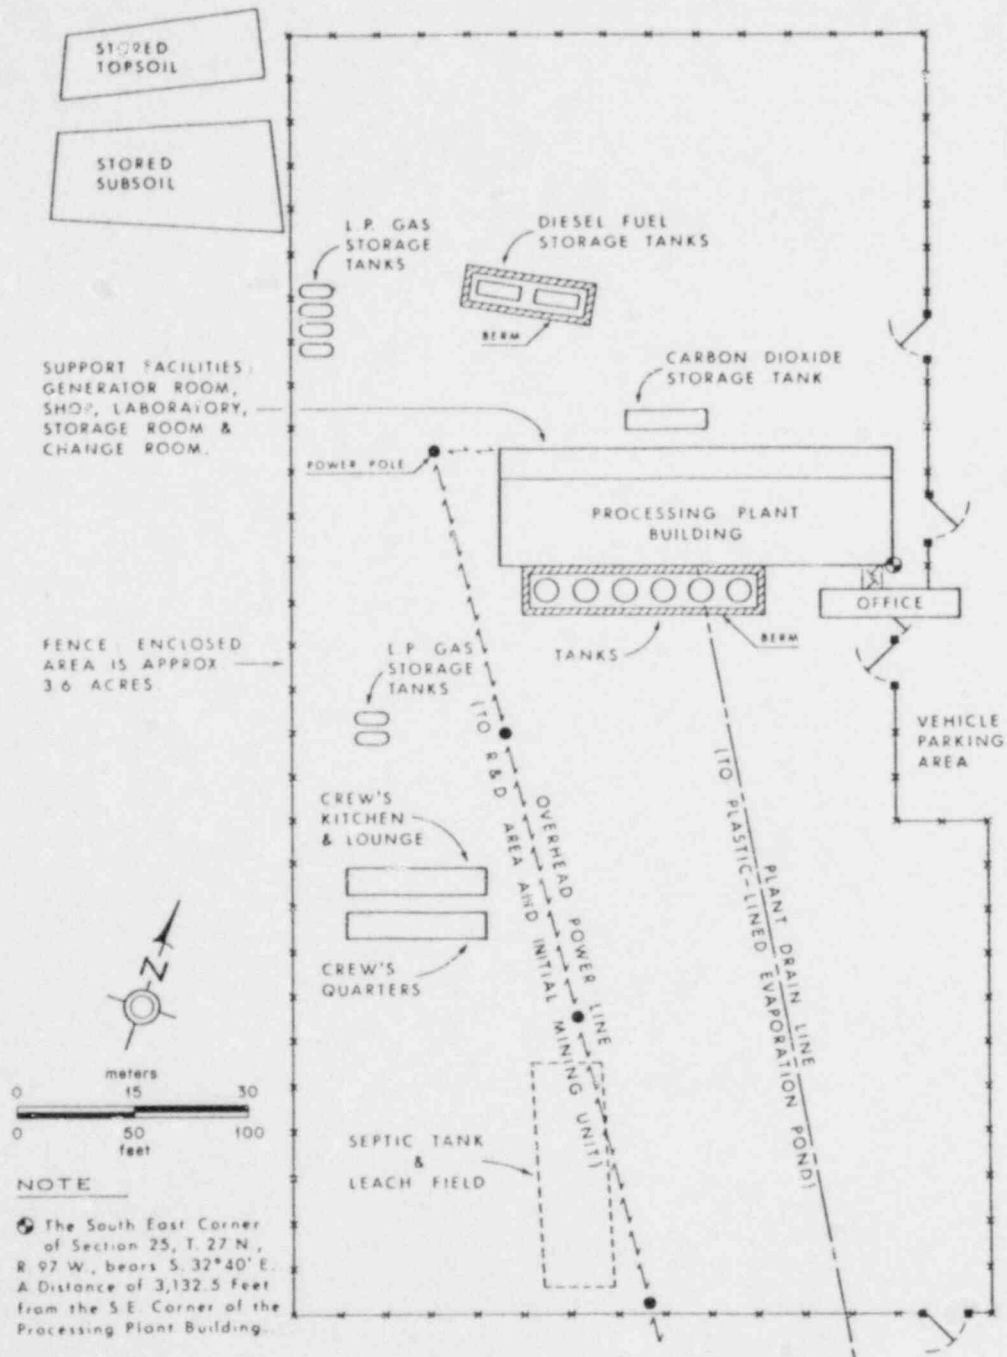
Plant facilities layout. Source: ER, Fig. 3.3-1.
